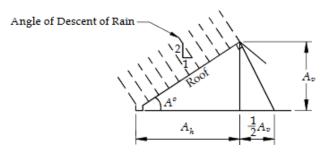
Single slope roofing freely exposed to the wind (NAHRIM 2014)
